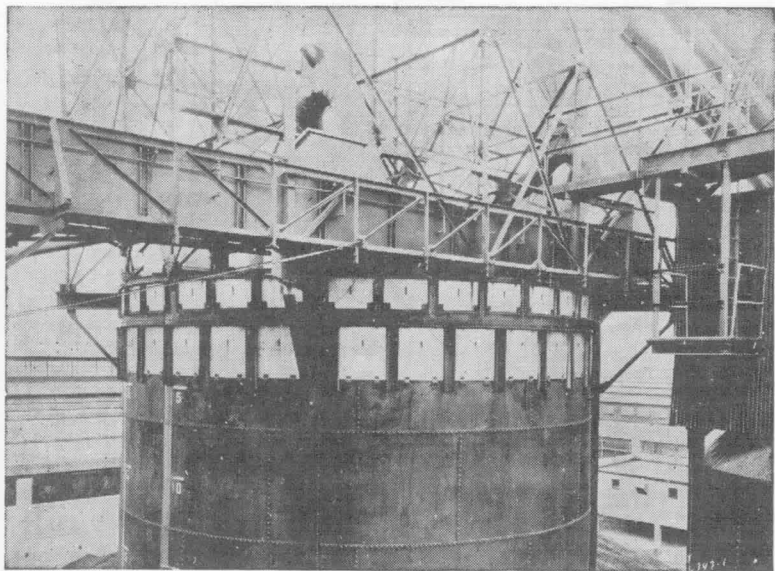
Method of venting a large cylindrical tank and dust collectors. Note in addition to the vents on the tank wall the coops or boxes with light covers located on top of the tank and on the conveyor housing.
